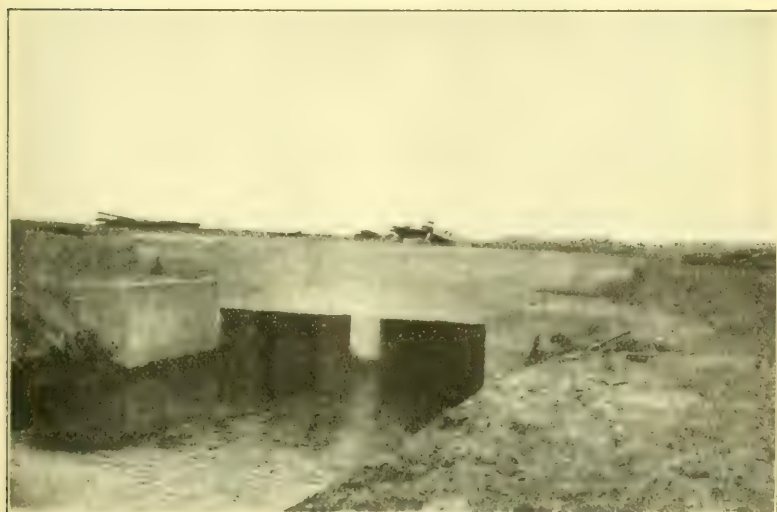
CONCRETE CULVERT OR SIPHON CONVEYING CANAL UNDER OUTLET CANAL FROM RESERVOIR.
